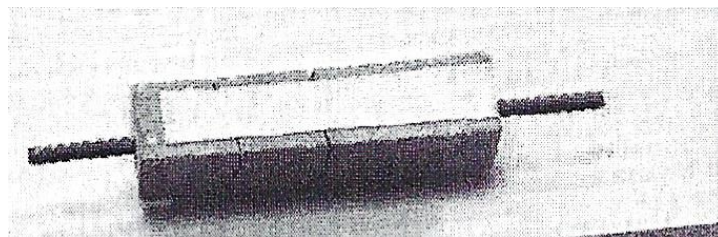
Test sample of crack-resistant coating on concrete substratum.
